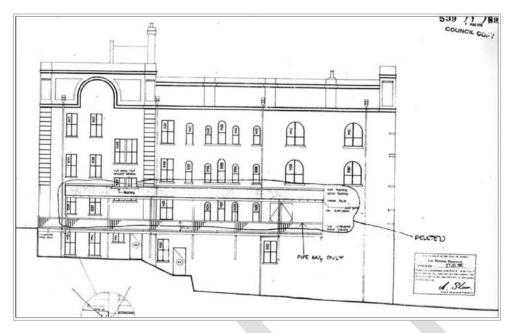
1982 Southern elevation. The balcony and new doorway were required to provide egress from the theatre auditorium. The roof structure over the balcony was however deleted. (Source: City of Sydney Archives 539/1/82)
